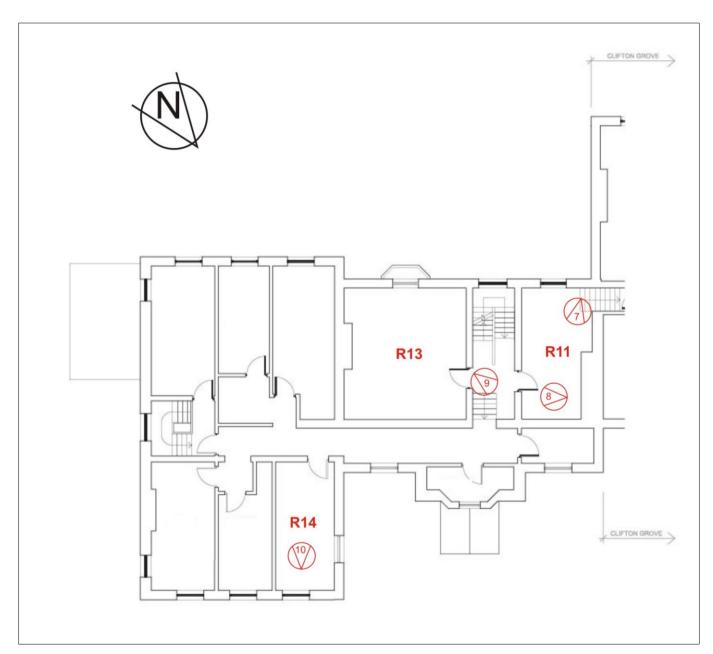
First Floor photo location plan (Base Plan © 105 West Architects Ltd)
